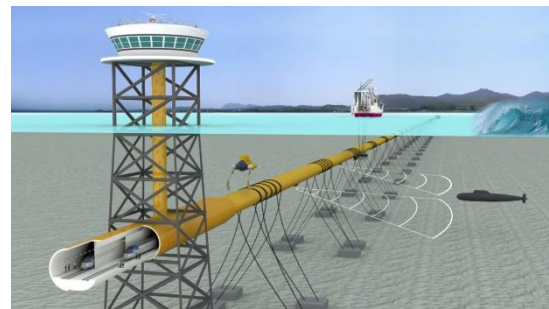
Concept of Submerged Floating Railway Tunnel (SFRT)
